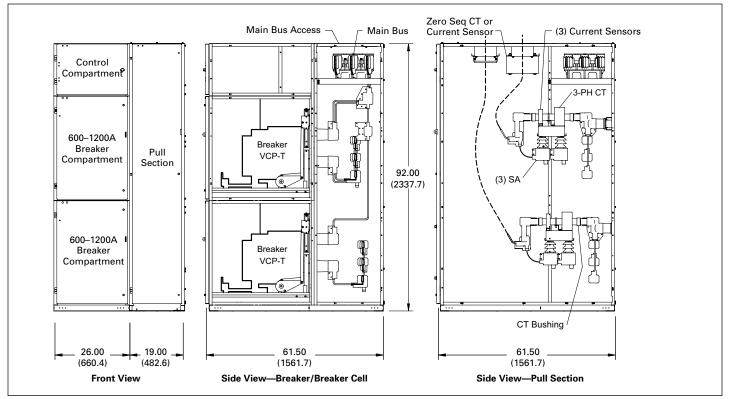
Typical Breaker/Breaker Unit and Pull Section, Cables Out the Top
